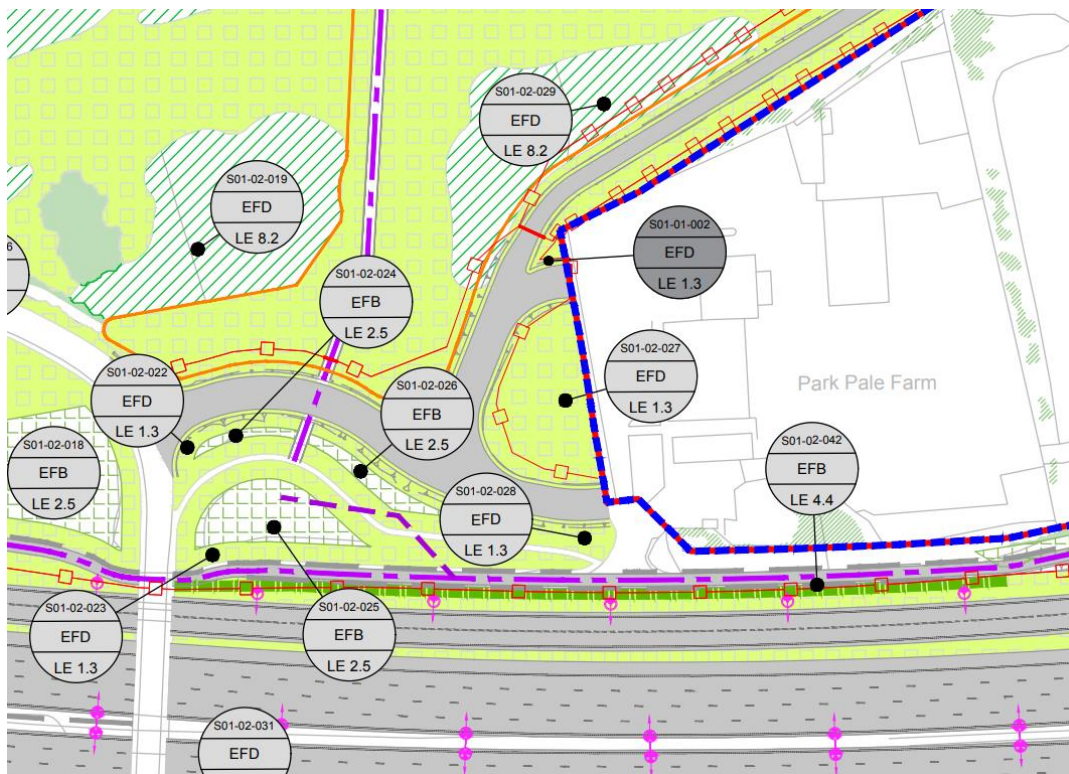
Extract from *Environmental Masterplan, Section 1, Sheet 2, Park Pale Farm, Harlex Haulage Depot* showing proposed revised access arrangements and extent of encroachment into currently undeveloped farmland.
